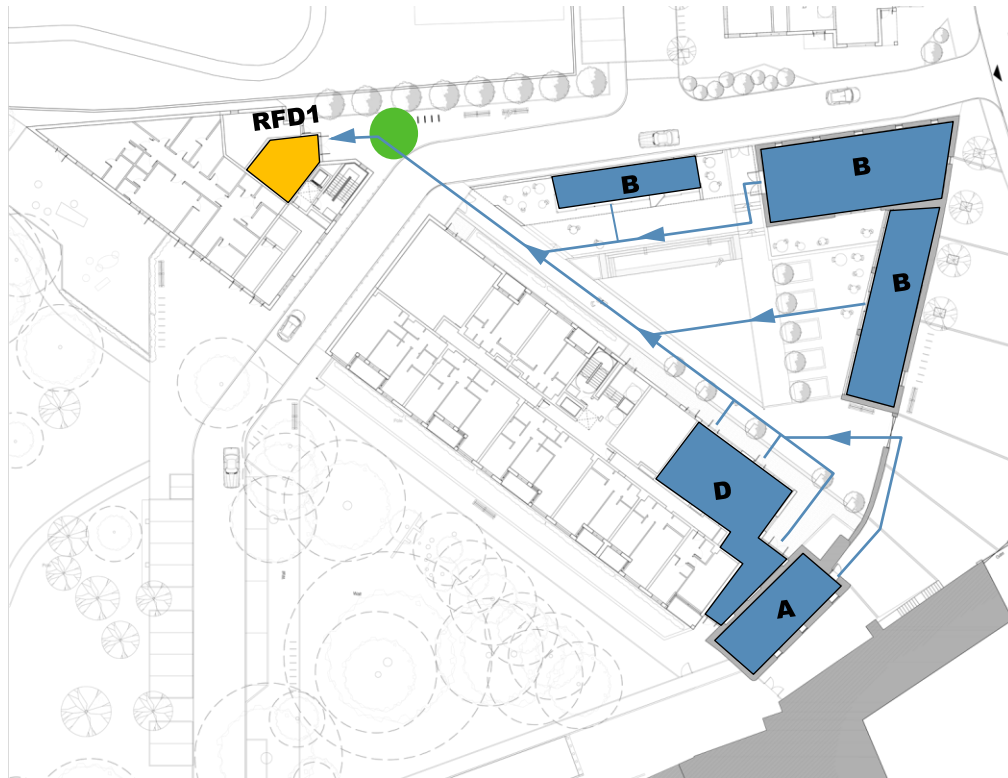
Ground Floor Plan highlighting Refuse Rooms + Access | NTS
